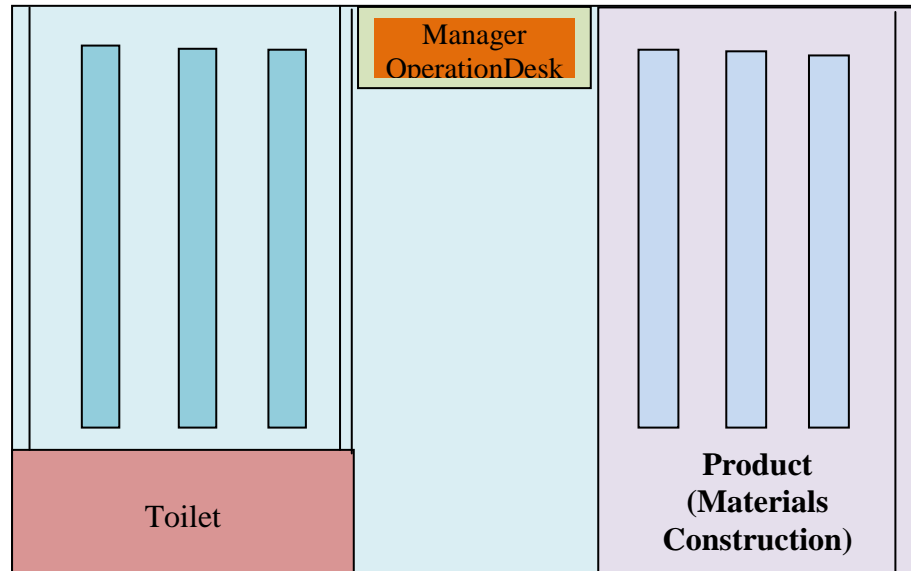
5 Materials Construction Building Design Plan (First Floor)
